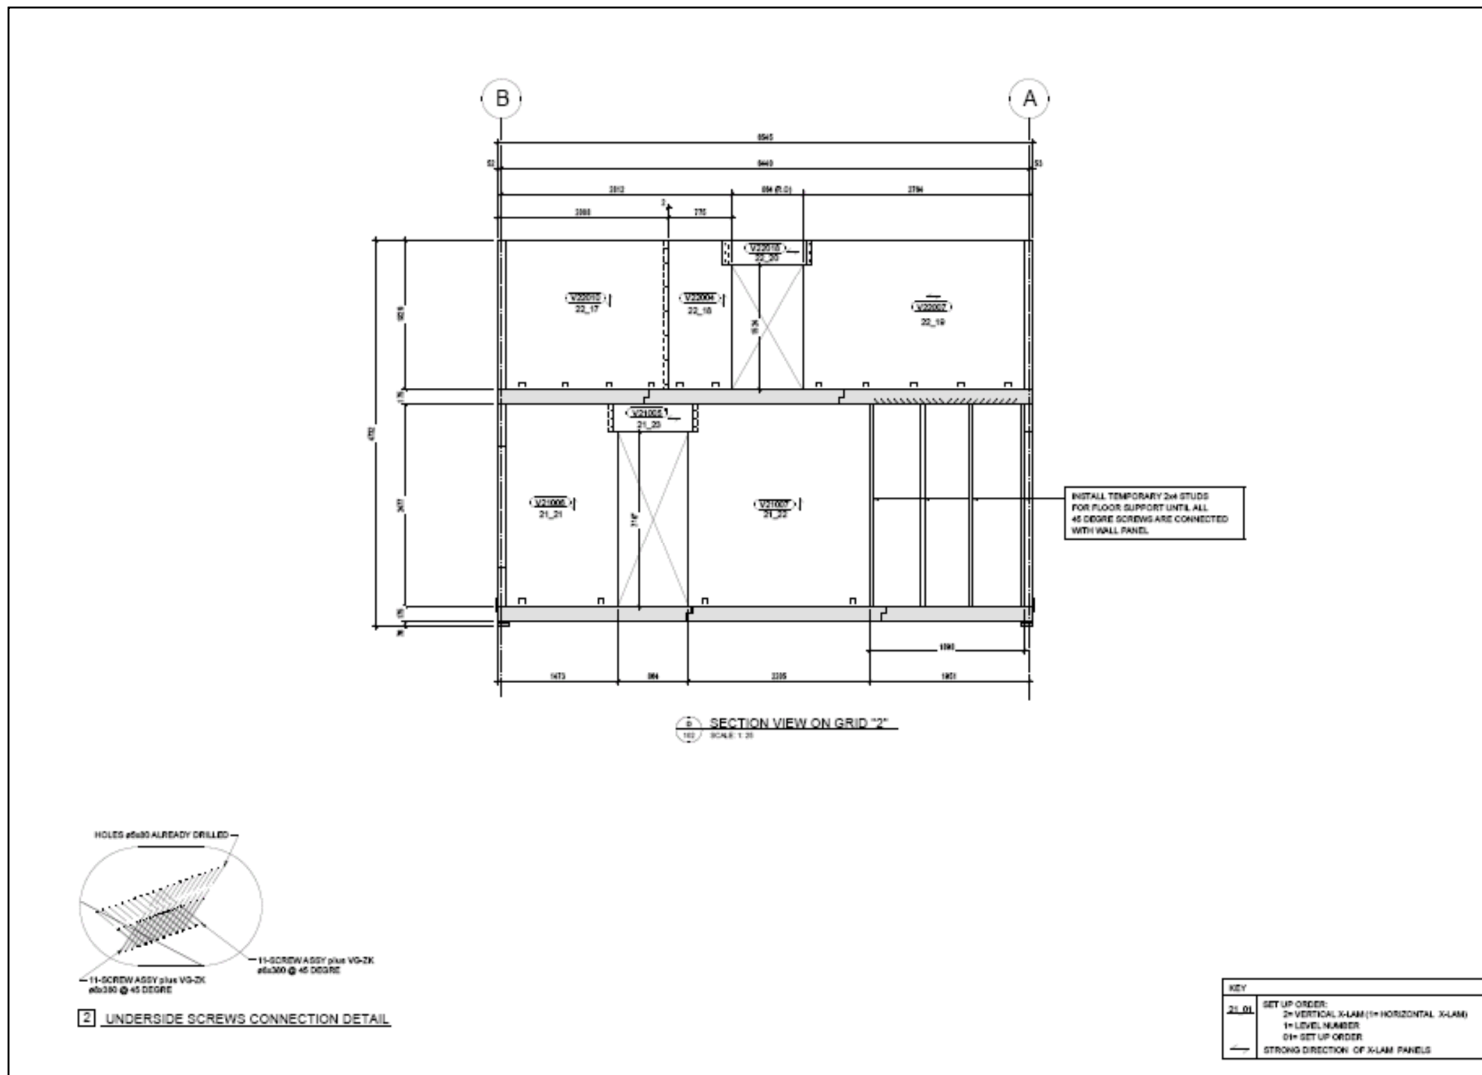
Section view on Grid "2" for CLT structural assembly.
